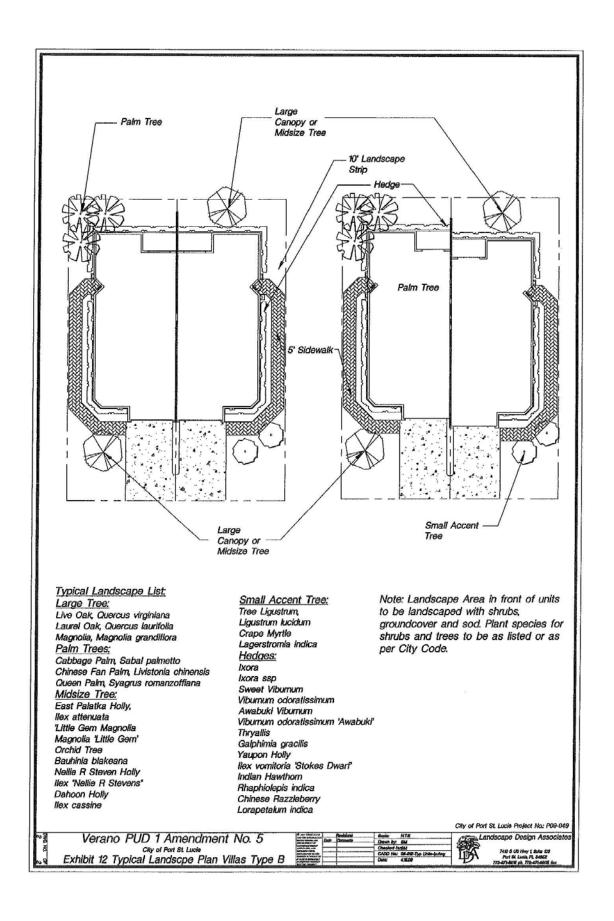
<u>TYPICAL UNITS LANDSCAPE PLANS</u>
